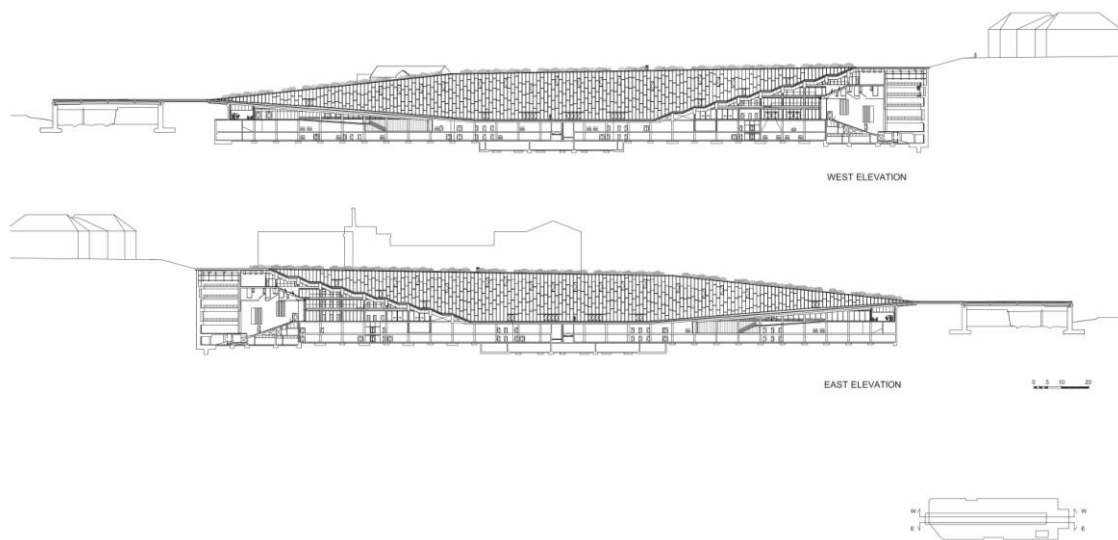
Ewha Campus Centre East elevation.¹⁶³
